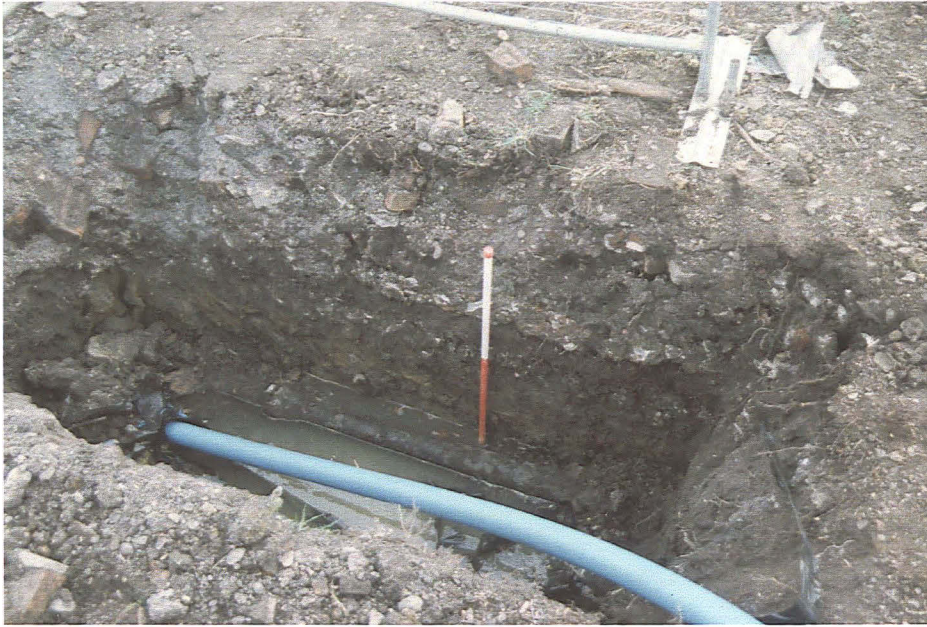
Section through possible surfaces or structural features at Priory Farm, Westborough (Section 3), looking southeast
